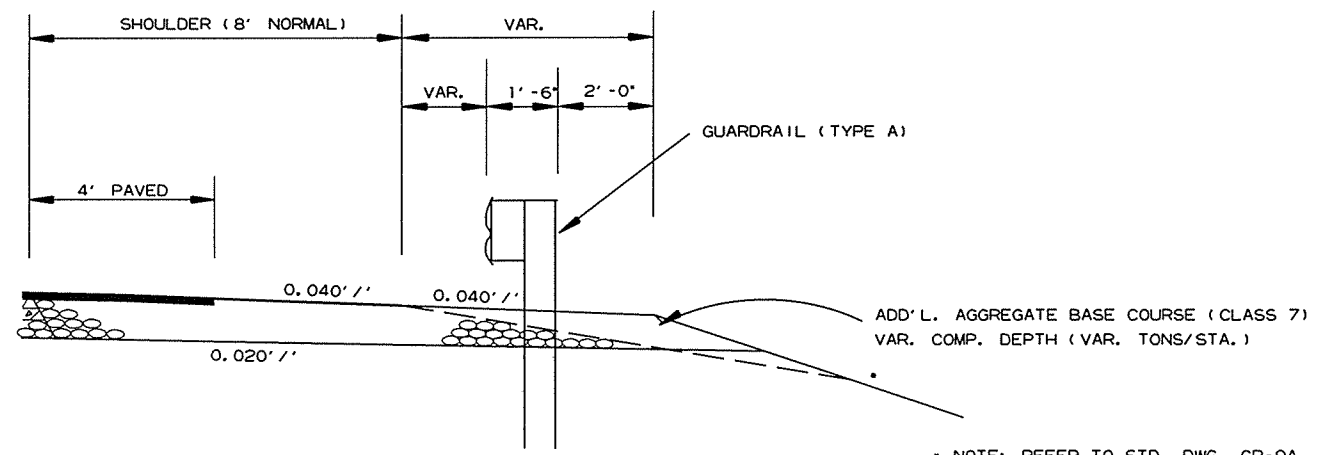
DETAIL FOR COUNTY ROAD TURNOUTS OPEN SHOULDER SECTION
